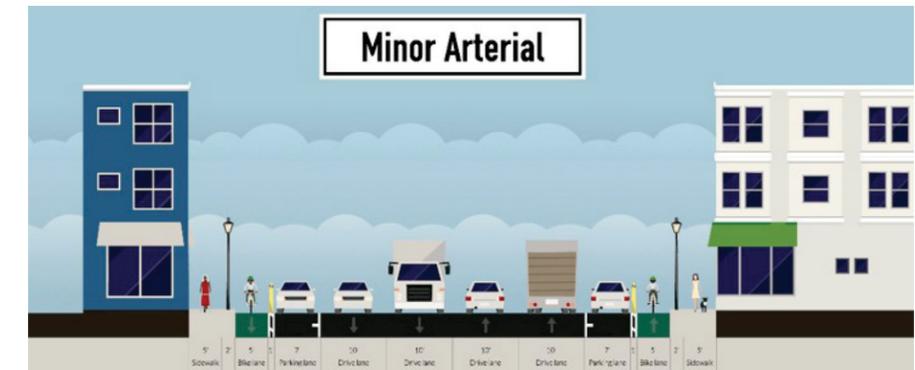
Medium Intensity Plan, Minor Arterial Street; Source: Section generated from streetmix.net/
